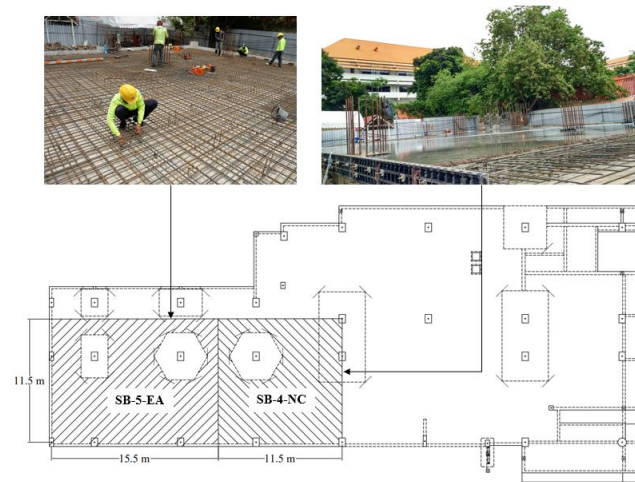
Plan view and site condition of slab on beam at construction site 2
